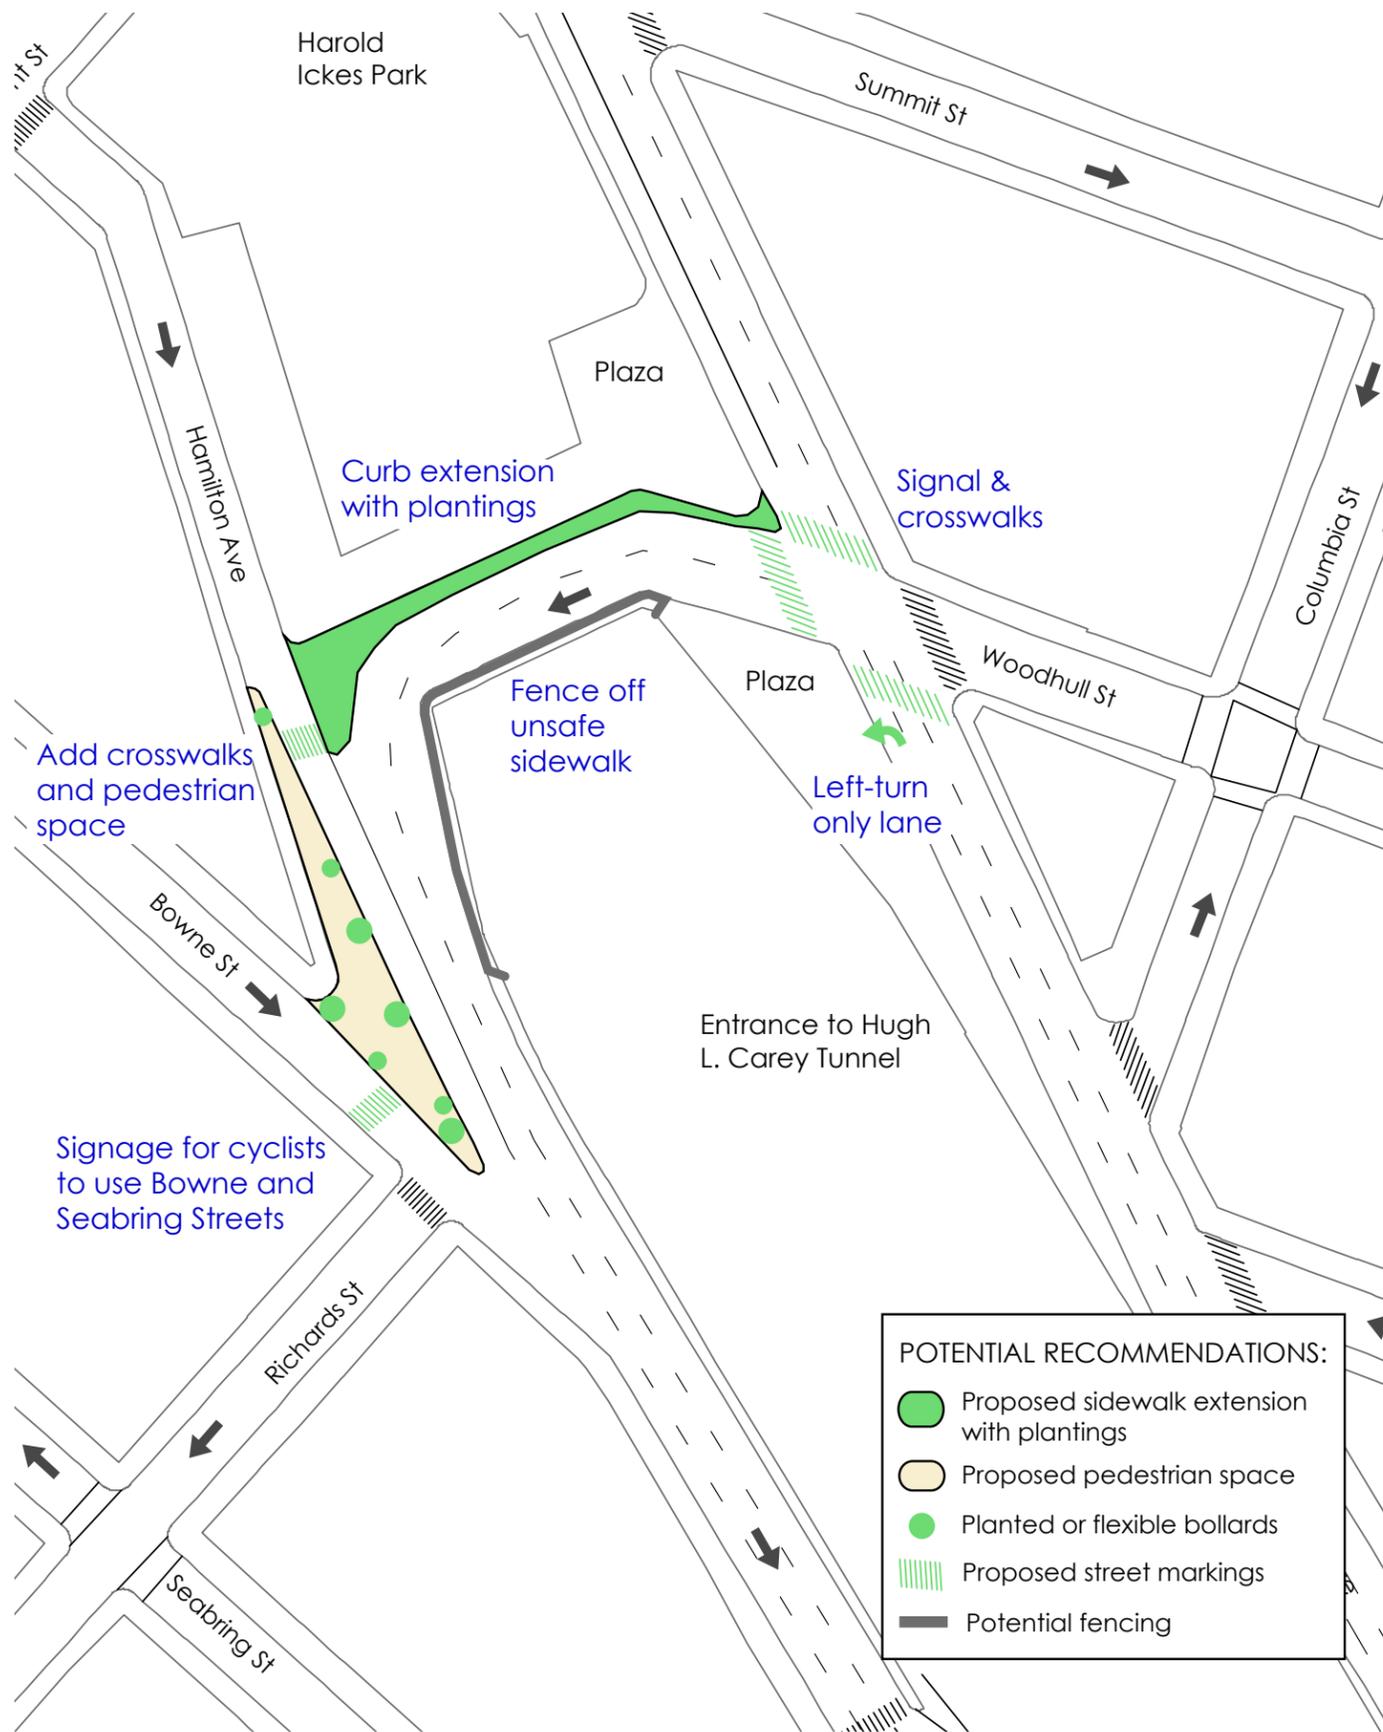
Recommendations identified for roadway issues at Woodhull Street.
